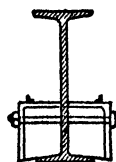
shows a STIRRUP-TYPE of hanger. This construction permits the framing of the wooden beam at any desired height, and has proved satisfactory. These hangers can be used with any depth of beam or girder, and are furnished by all manufacturers of steel JOIST-HANGERS of the various types, as well as by blacksmiths who can make WROUGHT-IRON STIRRUPS. Fig. 38
